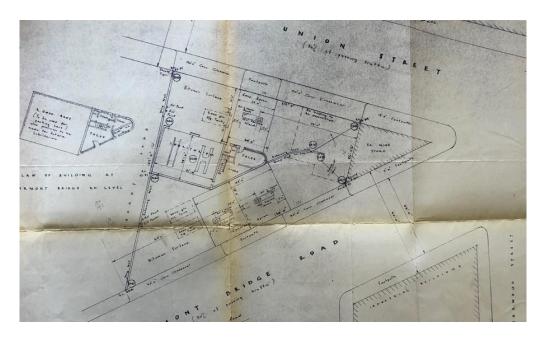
1954 – Plan submitted as part of DA 804/54, for a new service Station (Source: City of Sydney Archives, DA 804/54, 'Pyrmont Bridge Road & 65/69 Union Street, Pyrmont. Erection of a two level Service Station. Vacuum Oil Company Pty Ltd.')
